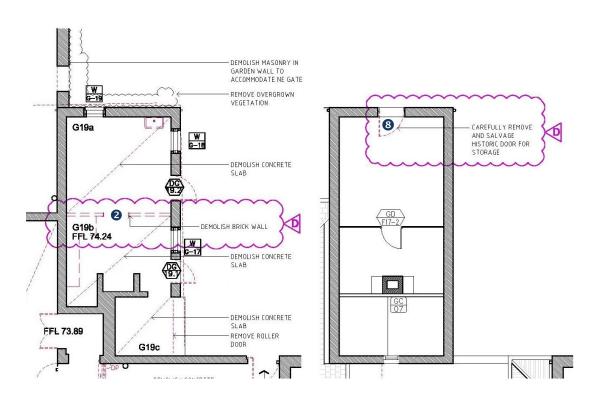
Landscape plan, ground and loft plan for Stables Building highlighting proposed locations of proposed modifications.
